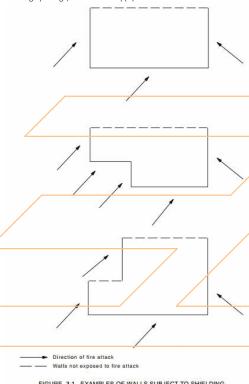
EXAMPLES OF WALLS SUBJECT TO SHIELDING
